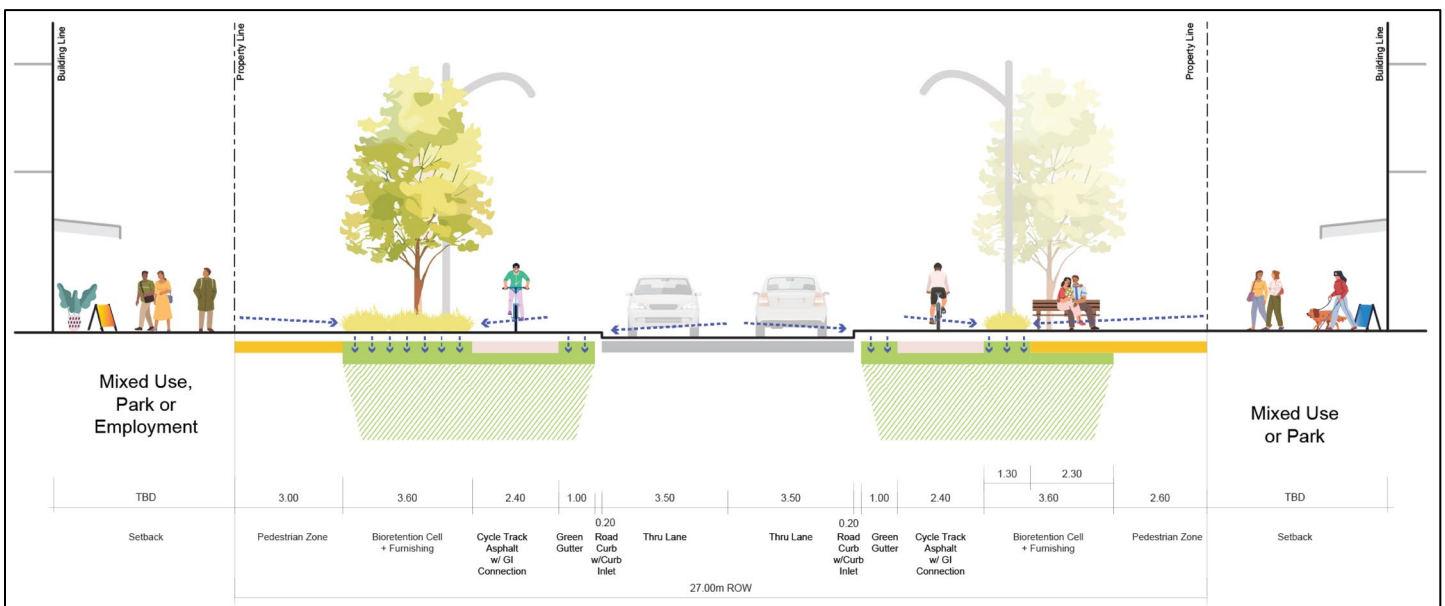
Dufferin Street (Northern Street to Sheppard Avenue West) Cross-Section - Option 4
